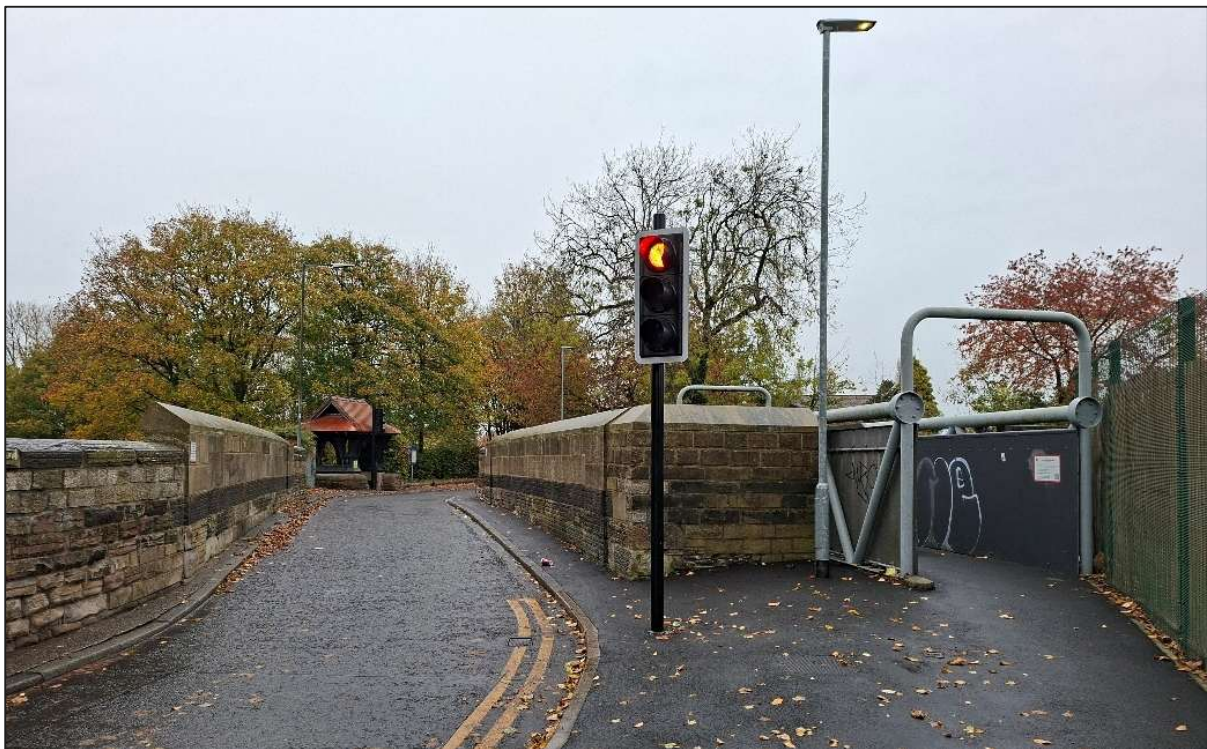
New Street – Sherdley Primary School Secondary Access
